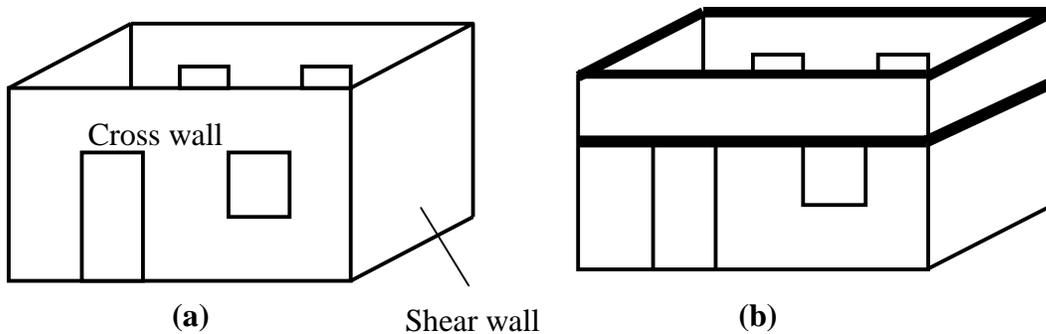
Buildings without roof (a) without bands (b) with RC lintel and roof bands
